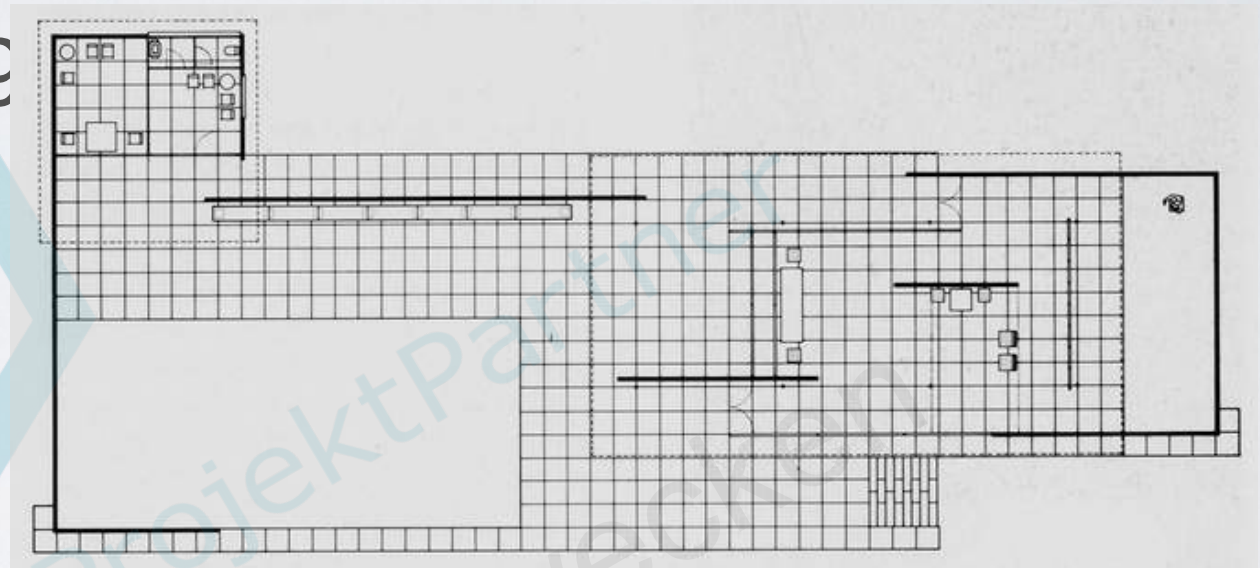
and 10: Plan of Barcelona-Pavillon and Interior
